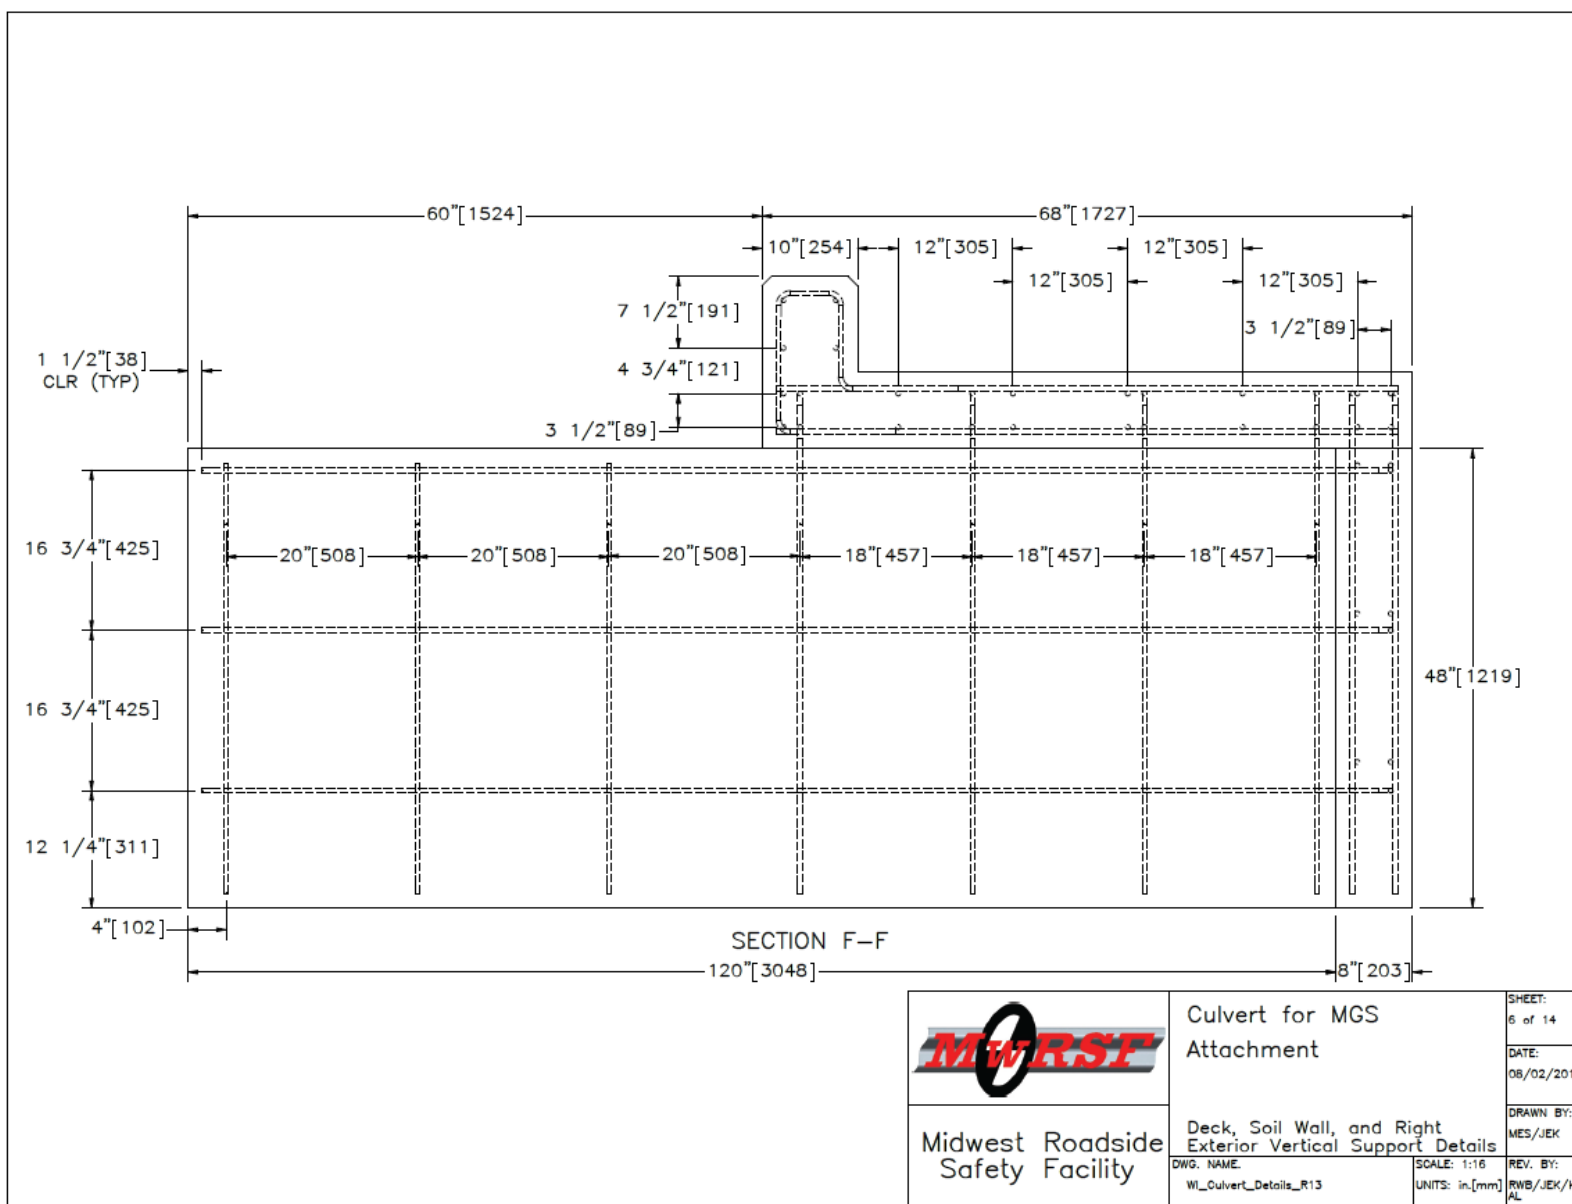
Top Slab, Soil Retaining Wall, Right Exterior Vertical Support Wall Details, Test Nos. CMGS-1 and CMGS-2
